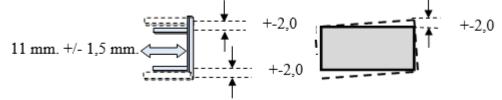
Depth of Ponzi rubber cavity (11 mm. +/- 1.5 mm) and tolerances (+/- 2.0 mm) in the secondary seal of the glass unit.
